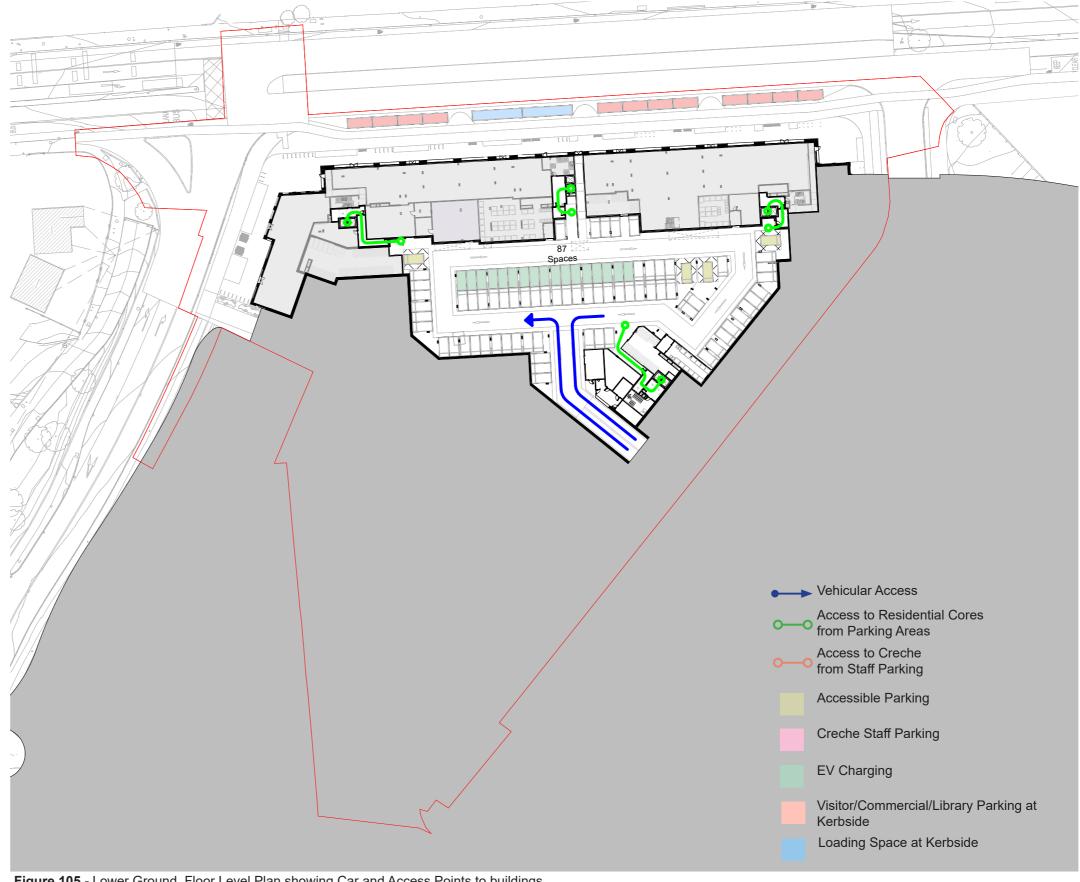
Lower Ground Floor Level Plan showing Car and Access Points to buildings.
